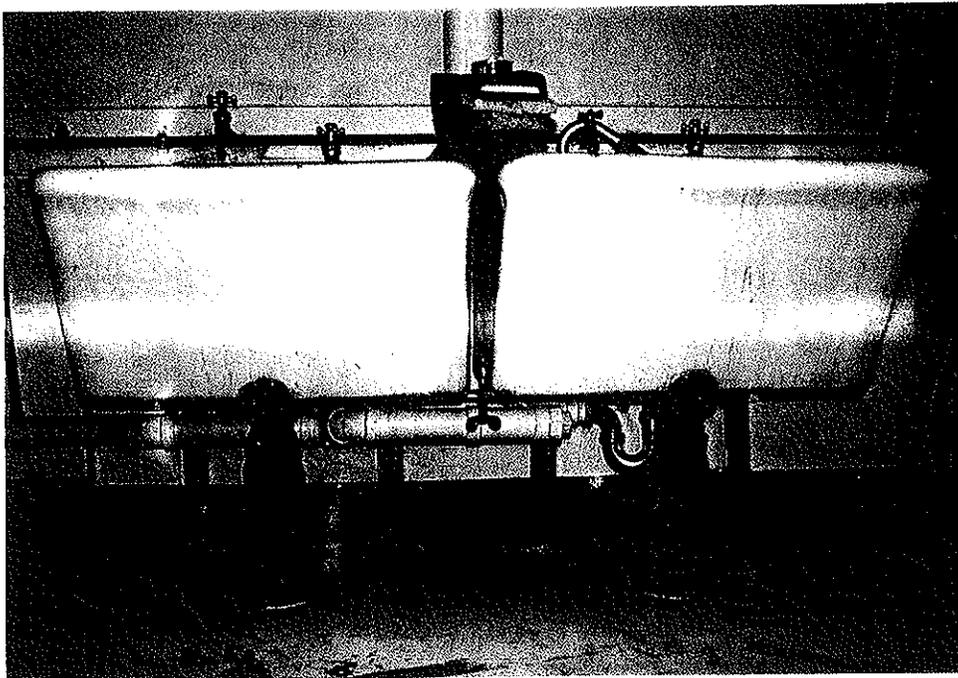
Weir House Basement - Laundry and Furnace Room [Room 009], West Wall, Circa-1900 Laundry Tubs (1994).
